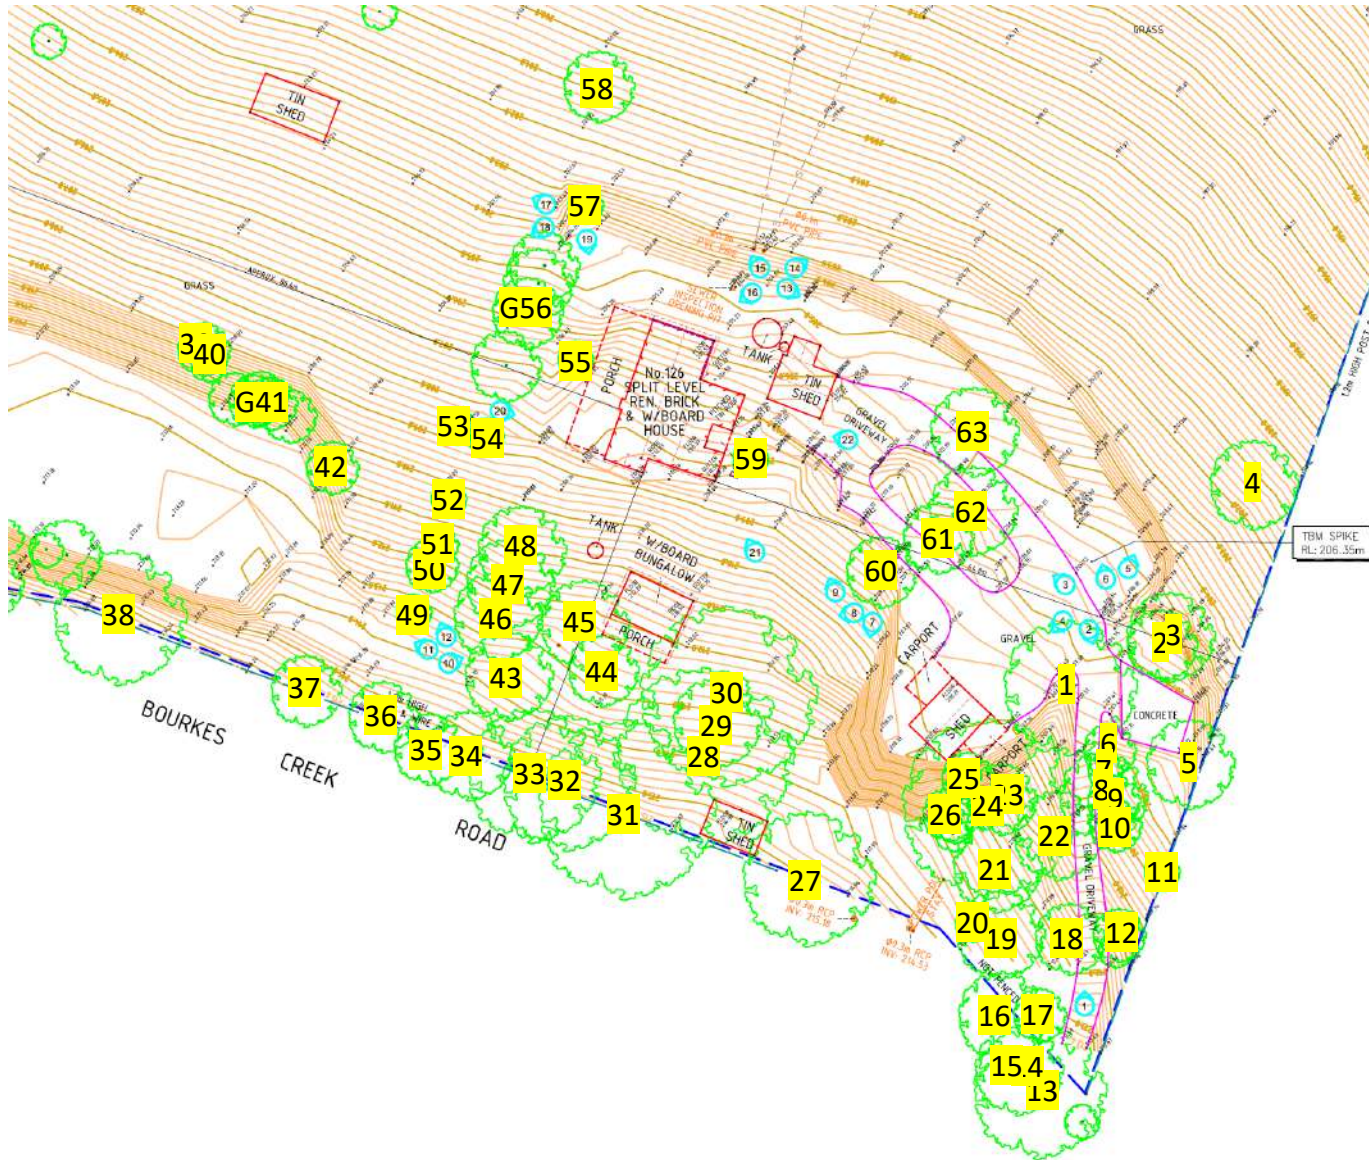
Zoomed in image of Feature and Level Plan showing tree numbers and location onsite.
